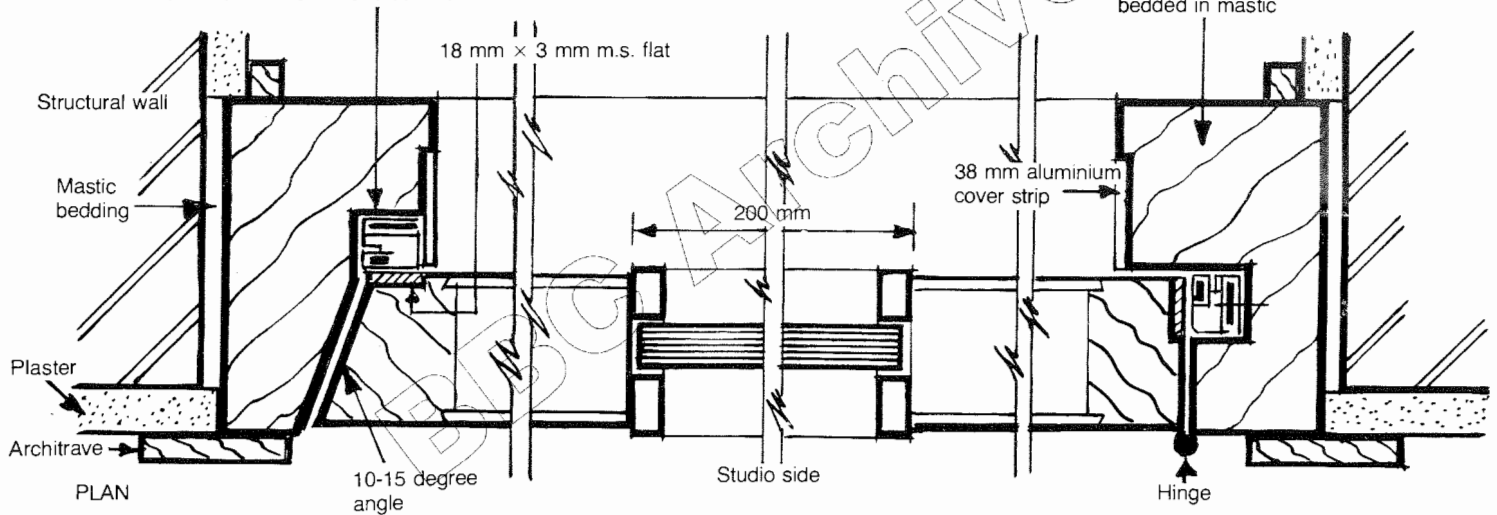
Typical acoustic personnel door illustrating angled leading edge and amended threshold
